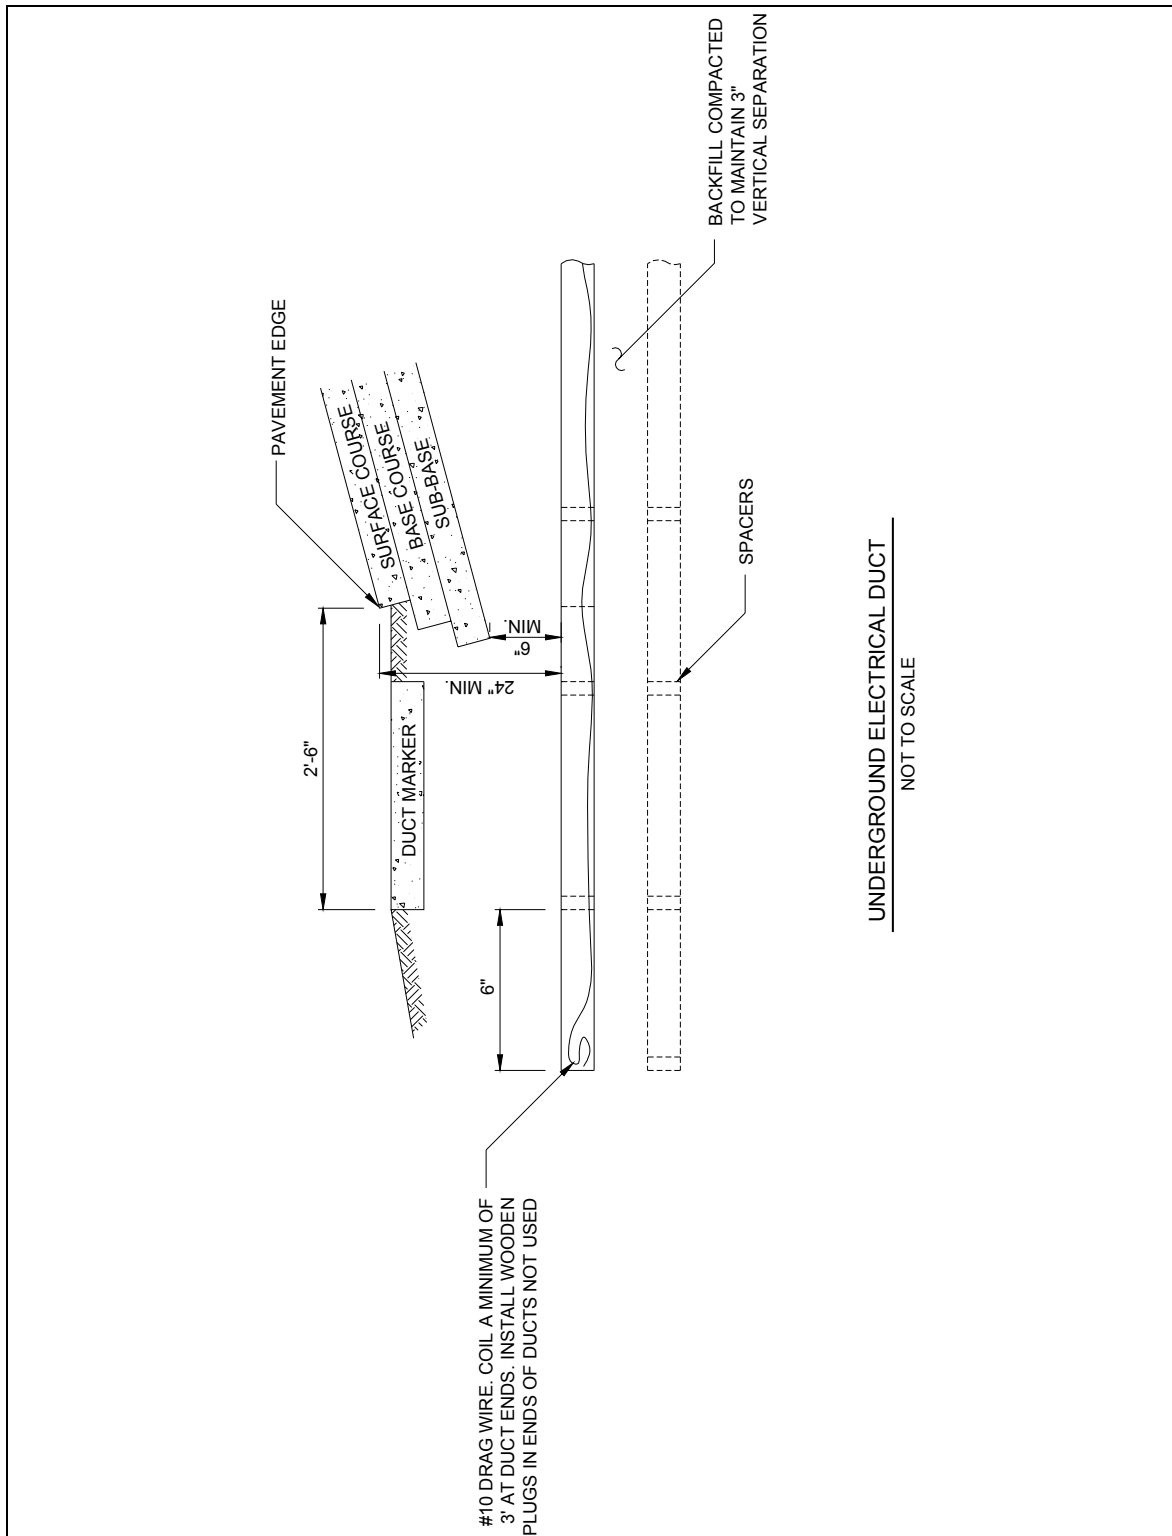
Standard Details for Underground Cable Installation – GL-600 Sheet 2C – Underground Electrical Duct
